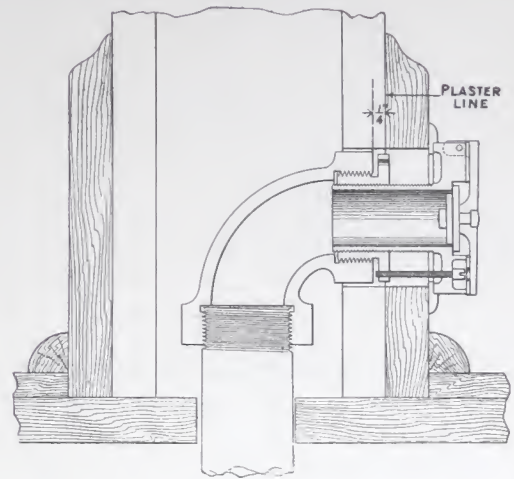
Shows inlet coupling in place. Also, drainage fitting, face of which is located  $\frac{1}{4}$  inch back of plaster line—which is recommended as the most suitable position. The opening through the baseboard should be  $2\frac{7}{8}$  inches diameter.
